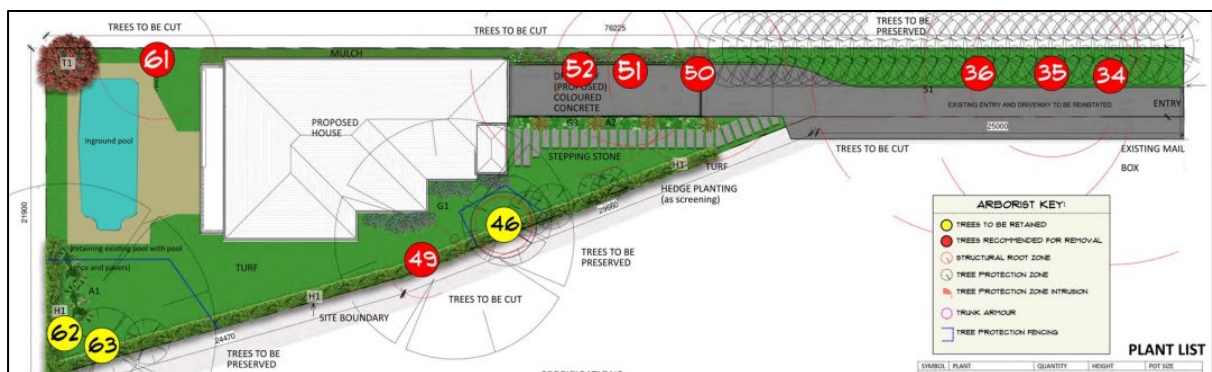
Original landscape plan showing proposed removal of 8 trees through the site.
